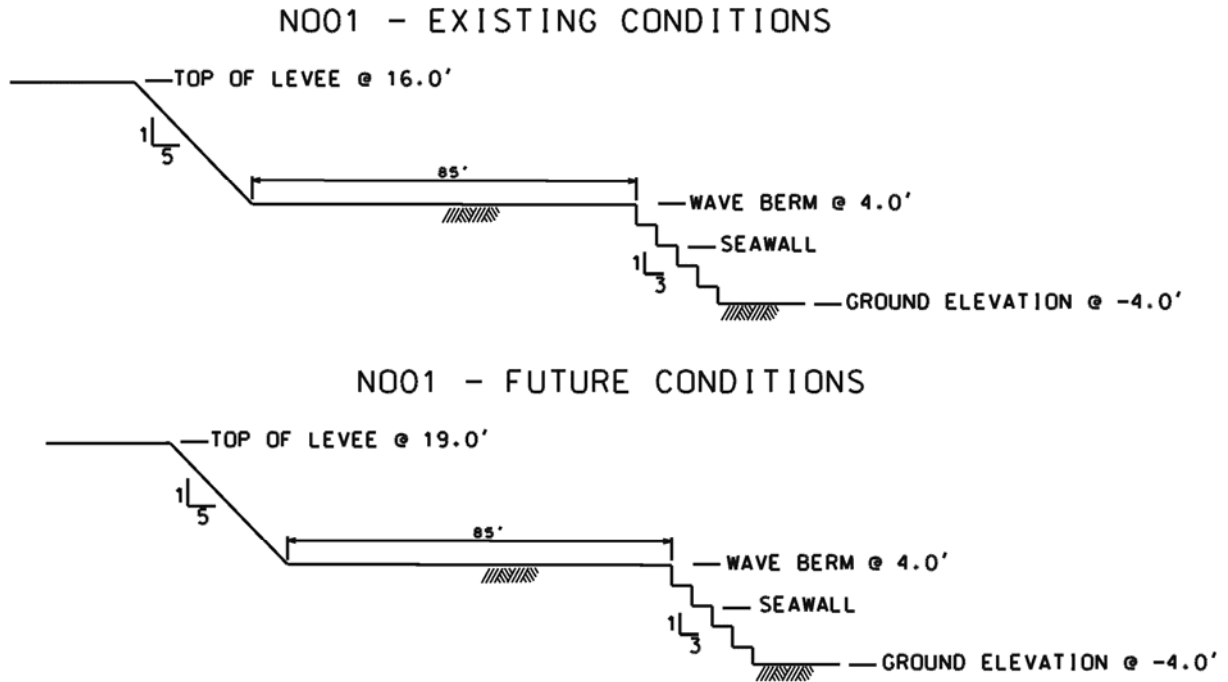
Cross-section profile for New Orleans Metro Lakefront levee (NO01) for existing (upper panel) and future conditions (lower panel).
